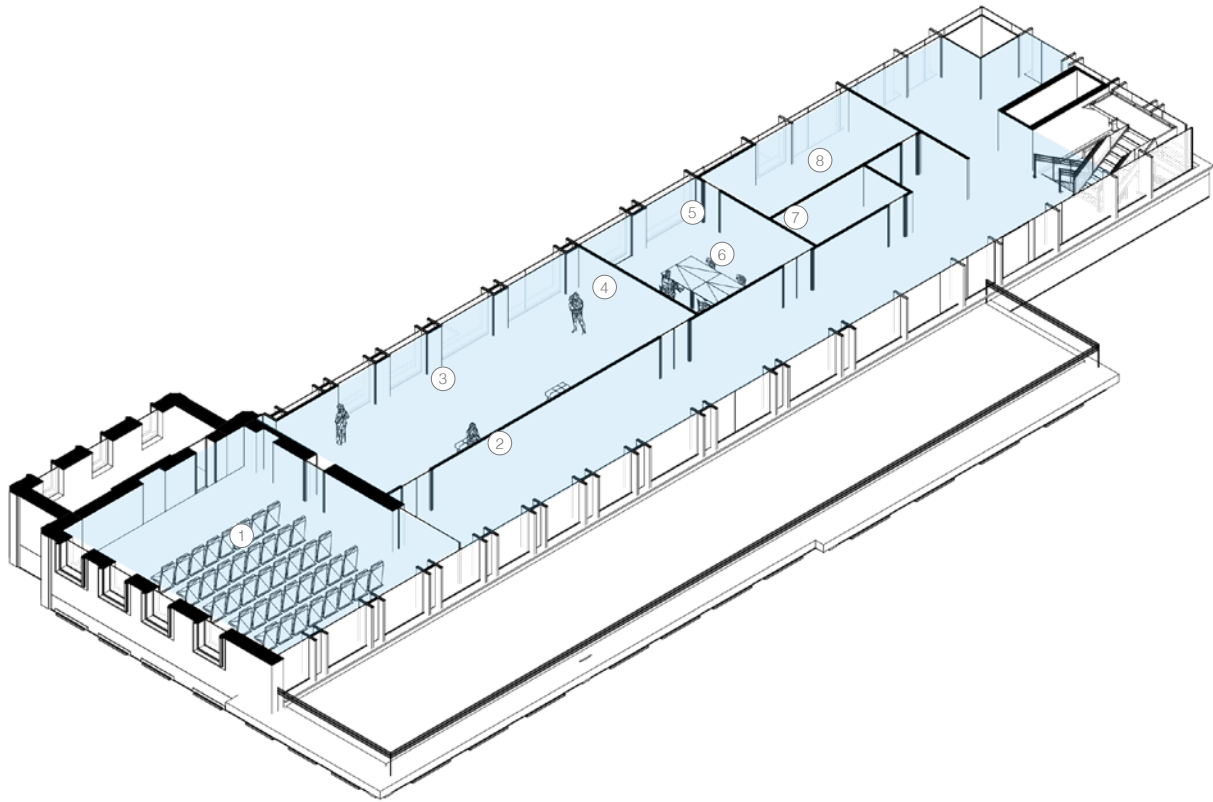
Exploded Axonometric of conditioned spaces for second floor
